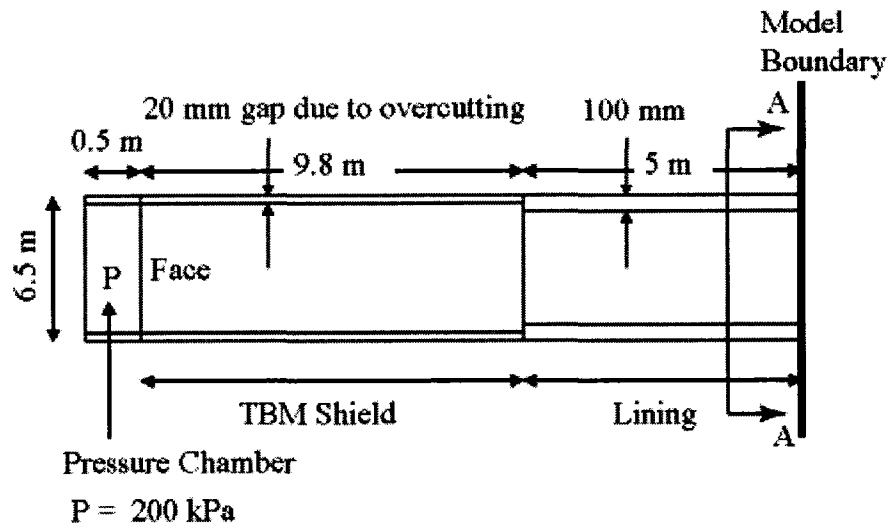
Tunnel model used in SLRT modeling and X-section along the tunnel lining and surrounding ground
